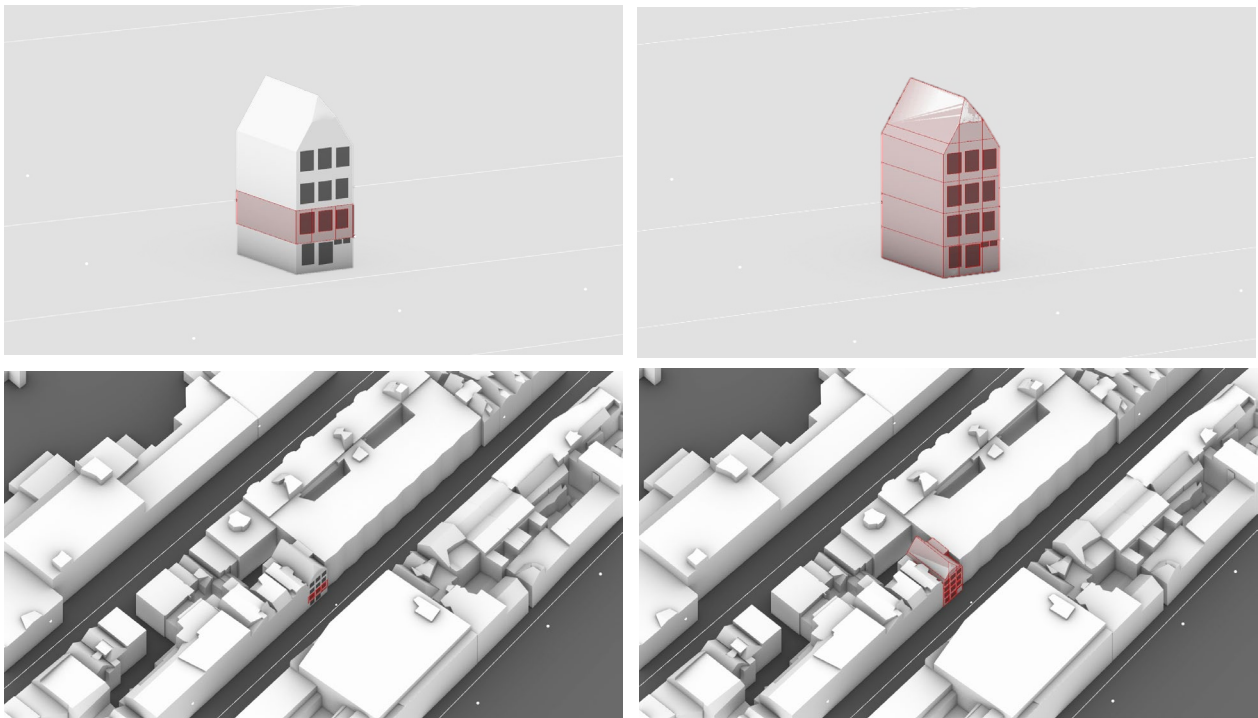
Single floor test (left) single building test (right), visualised in their urban context (bottom)
